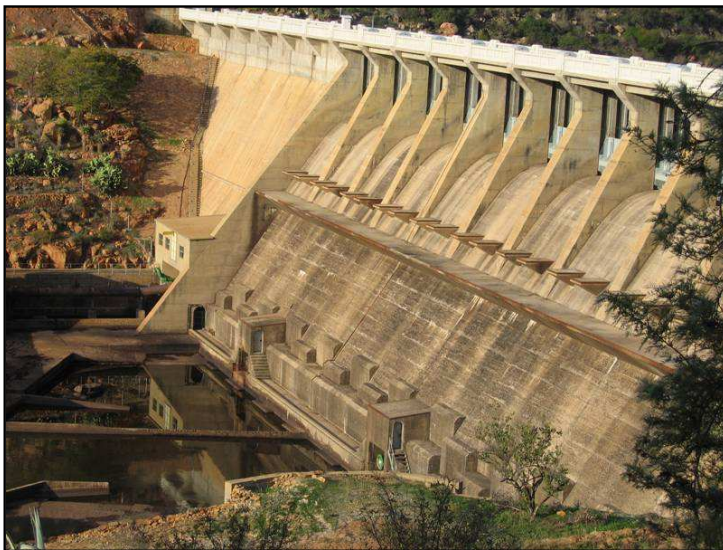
CDW62. The Clanwilliam Dam wall. The bulk of the wall was built in the 1930's but the upper portion with the sluice gates was added in 1966.
